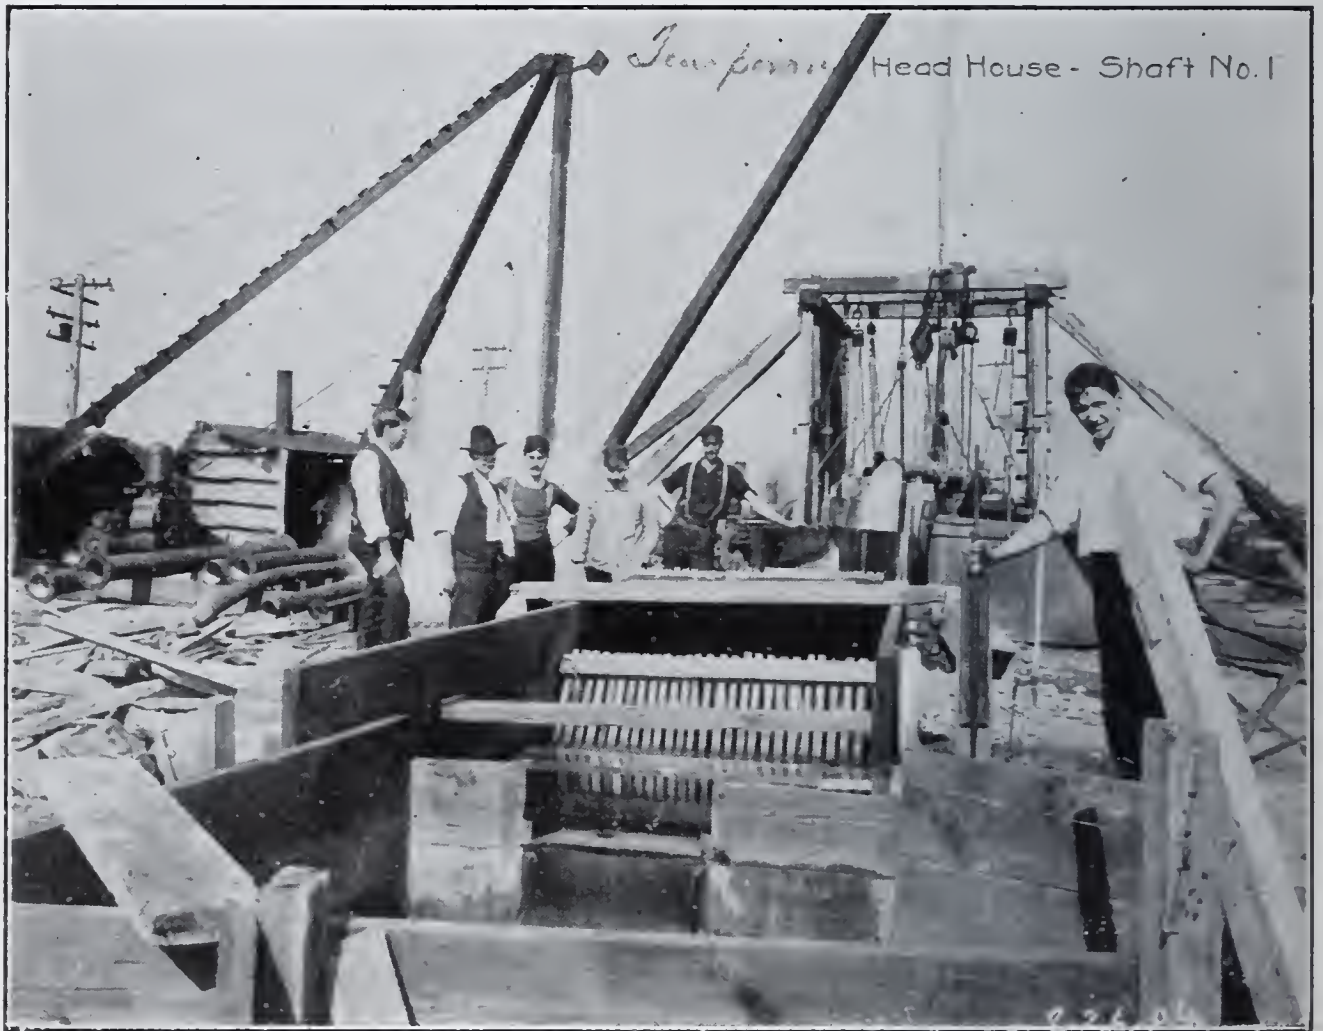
PLATE XVI.—TEMPORARY HEAD HOUSE, SHAFT NO. 1.
